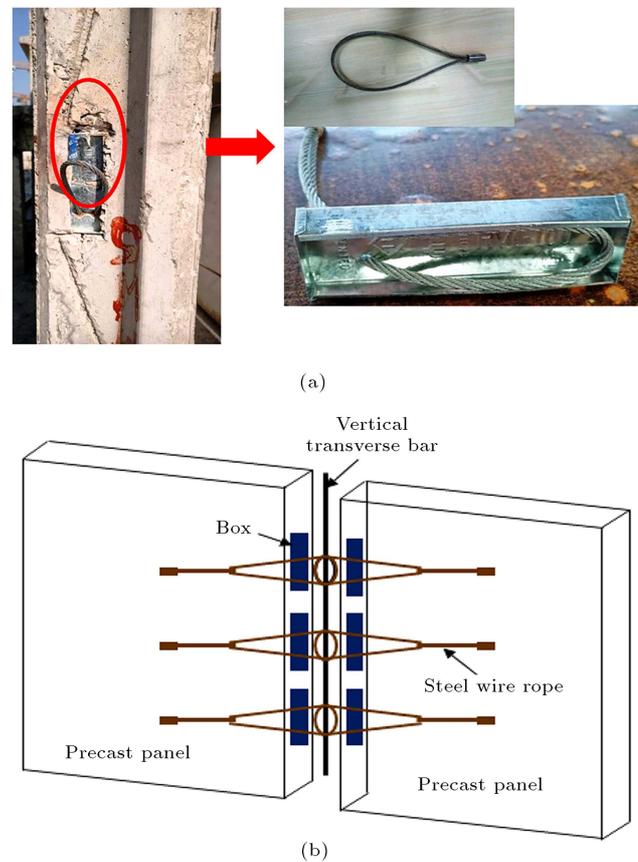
(a) Steel wire ropes inserted in wire box and embedded in the precast wall. (b) Schematic diagram of the joint.
